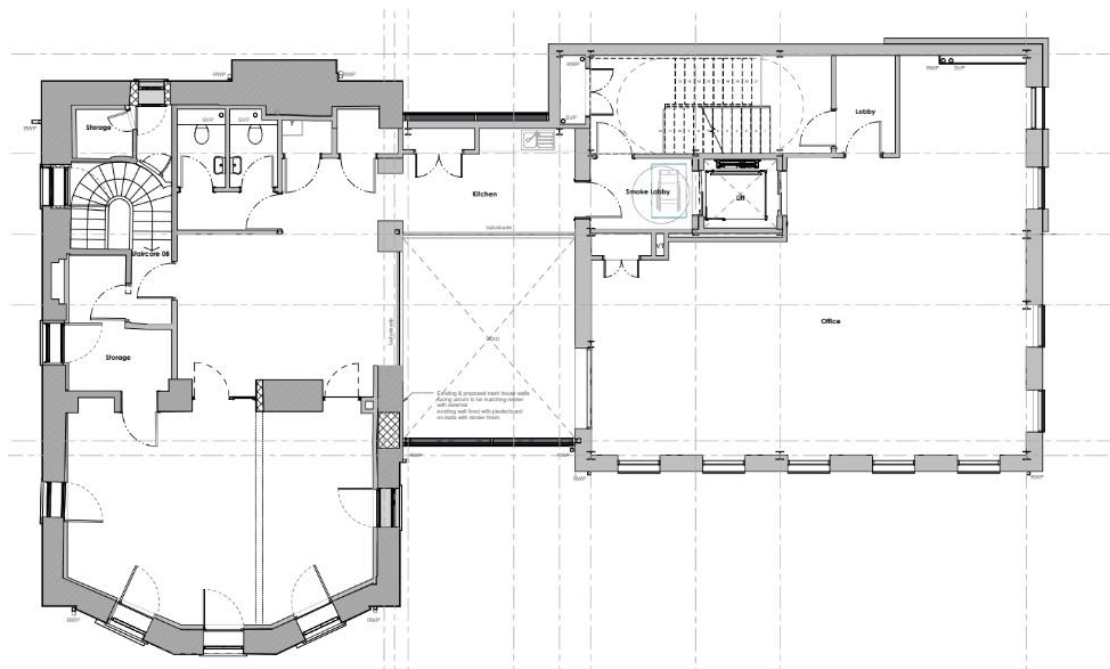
Nash Building Proposed First Floor © Gaunt Francis Architects
